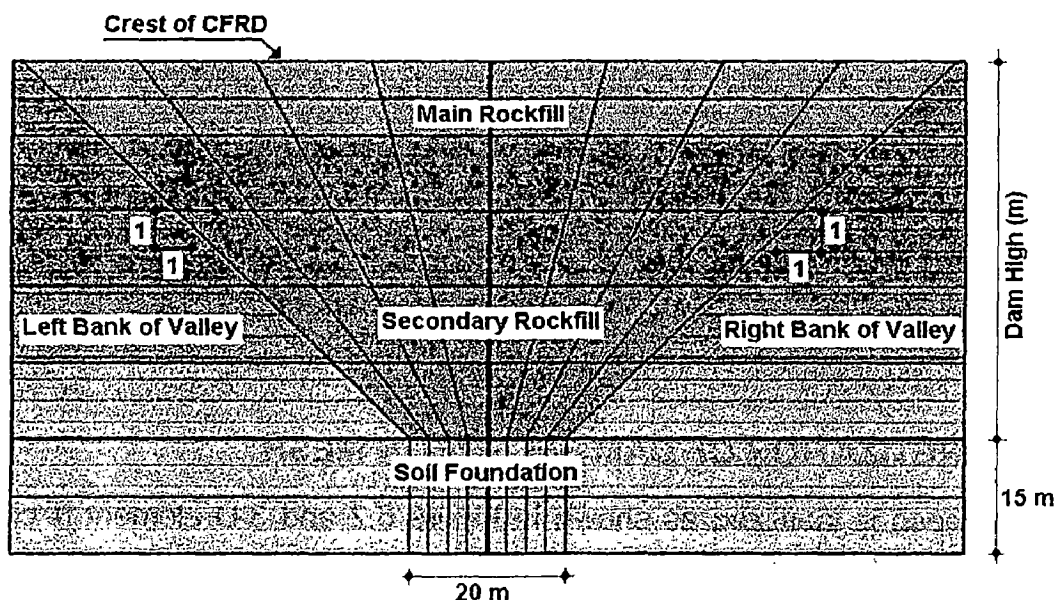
Typical of Concrete Face Rockfill Dam from Downstream View
